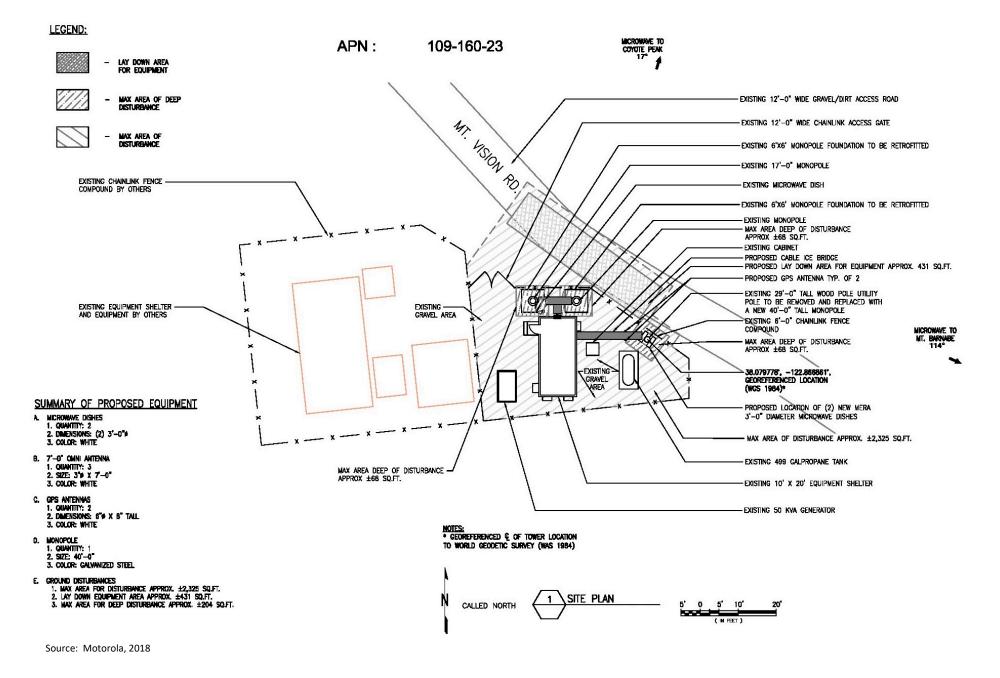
Site 8 - Point Reyes Hill Site Plan
